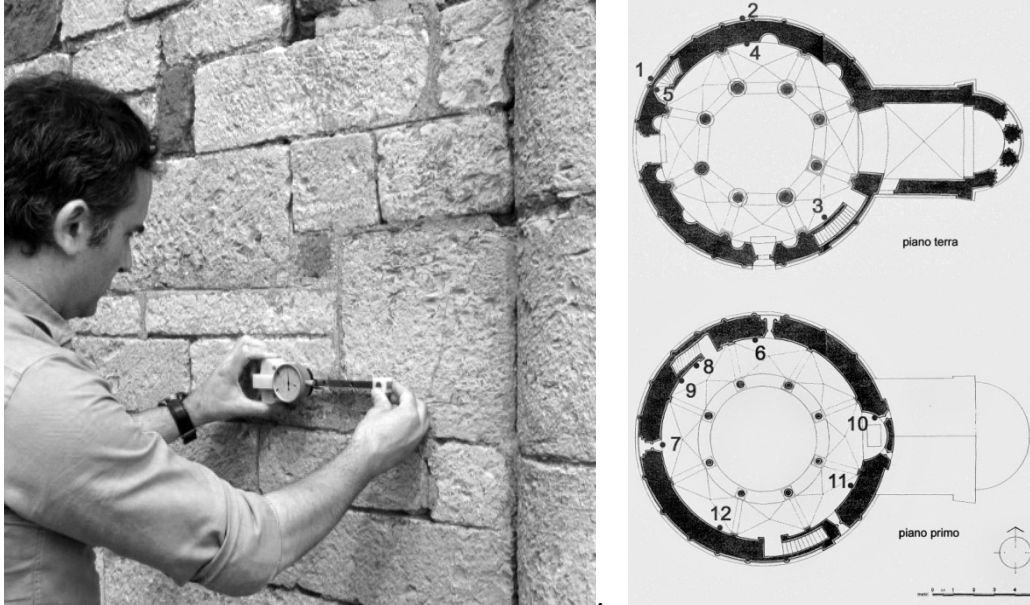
Mechanical removable crack-gauge and lay-out of the measuring points.
